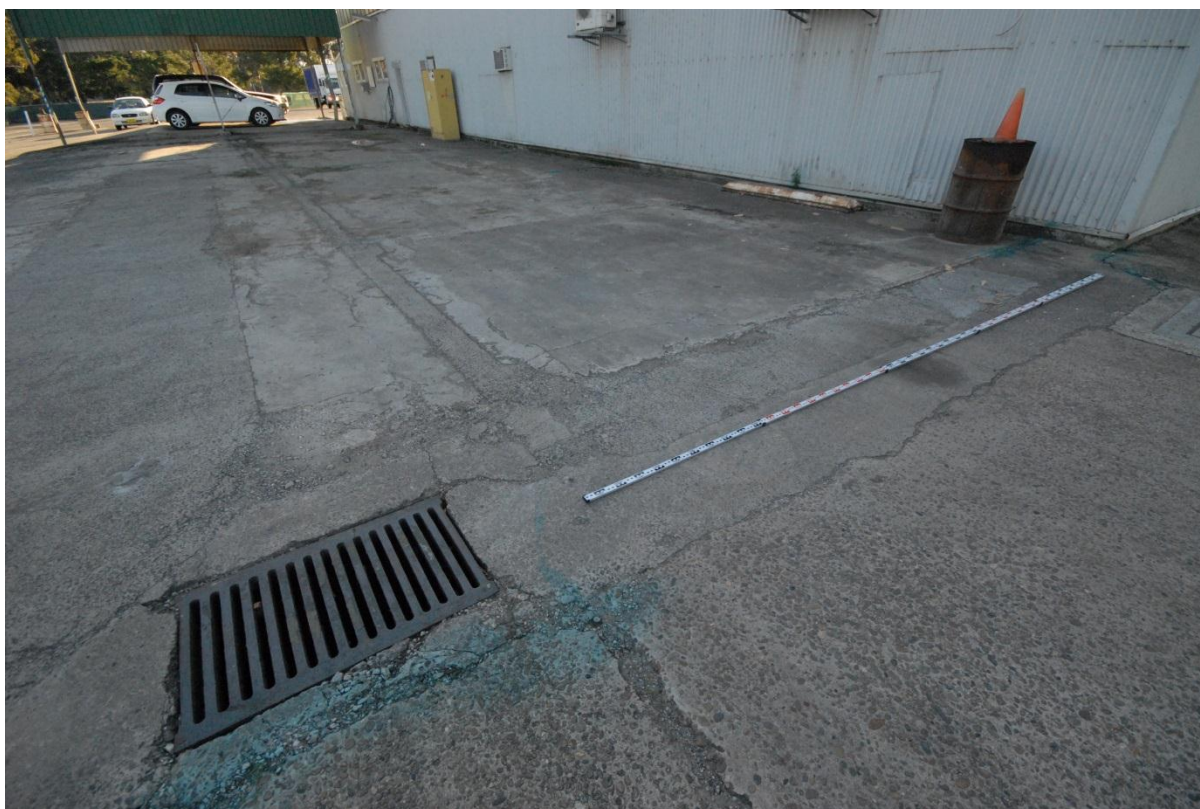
Detail of original surface drainage grill, (image no. B99 0218)
